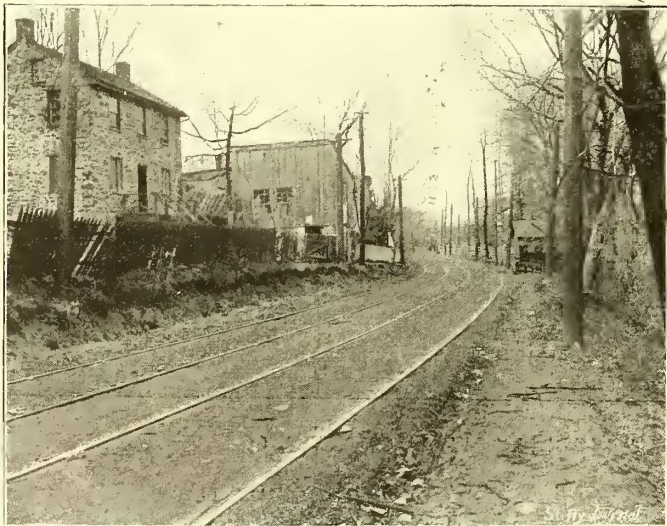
SECTION OF TRACK ON HIGHWAY
